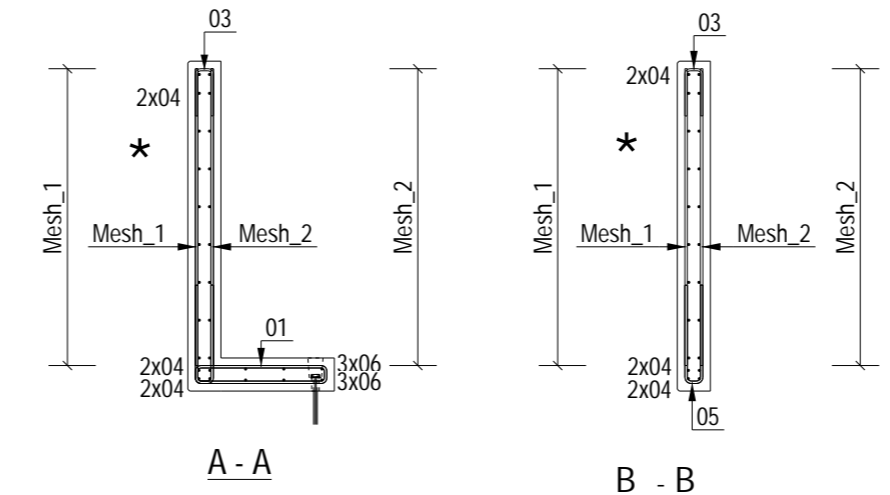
BYL-1462-PR-0019-RC1 Rev: C01
